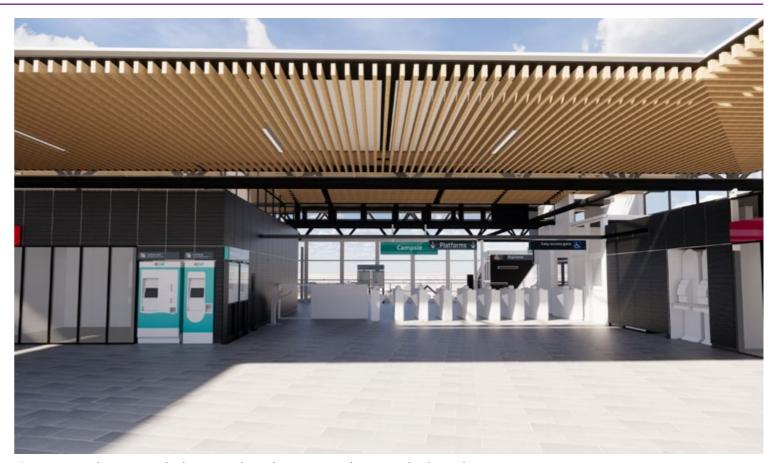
Indicative view looking west through existing gateline toward rail corridor
